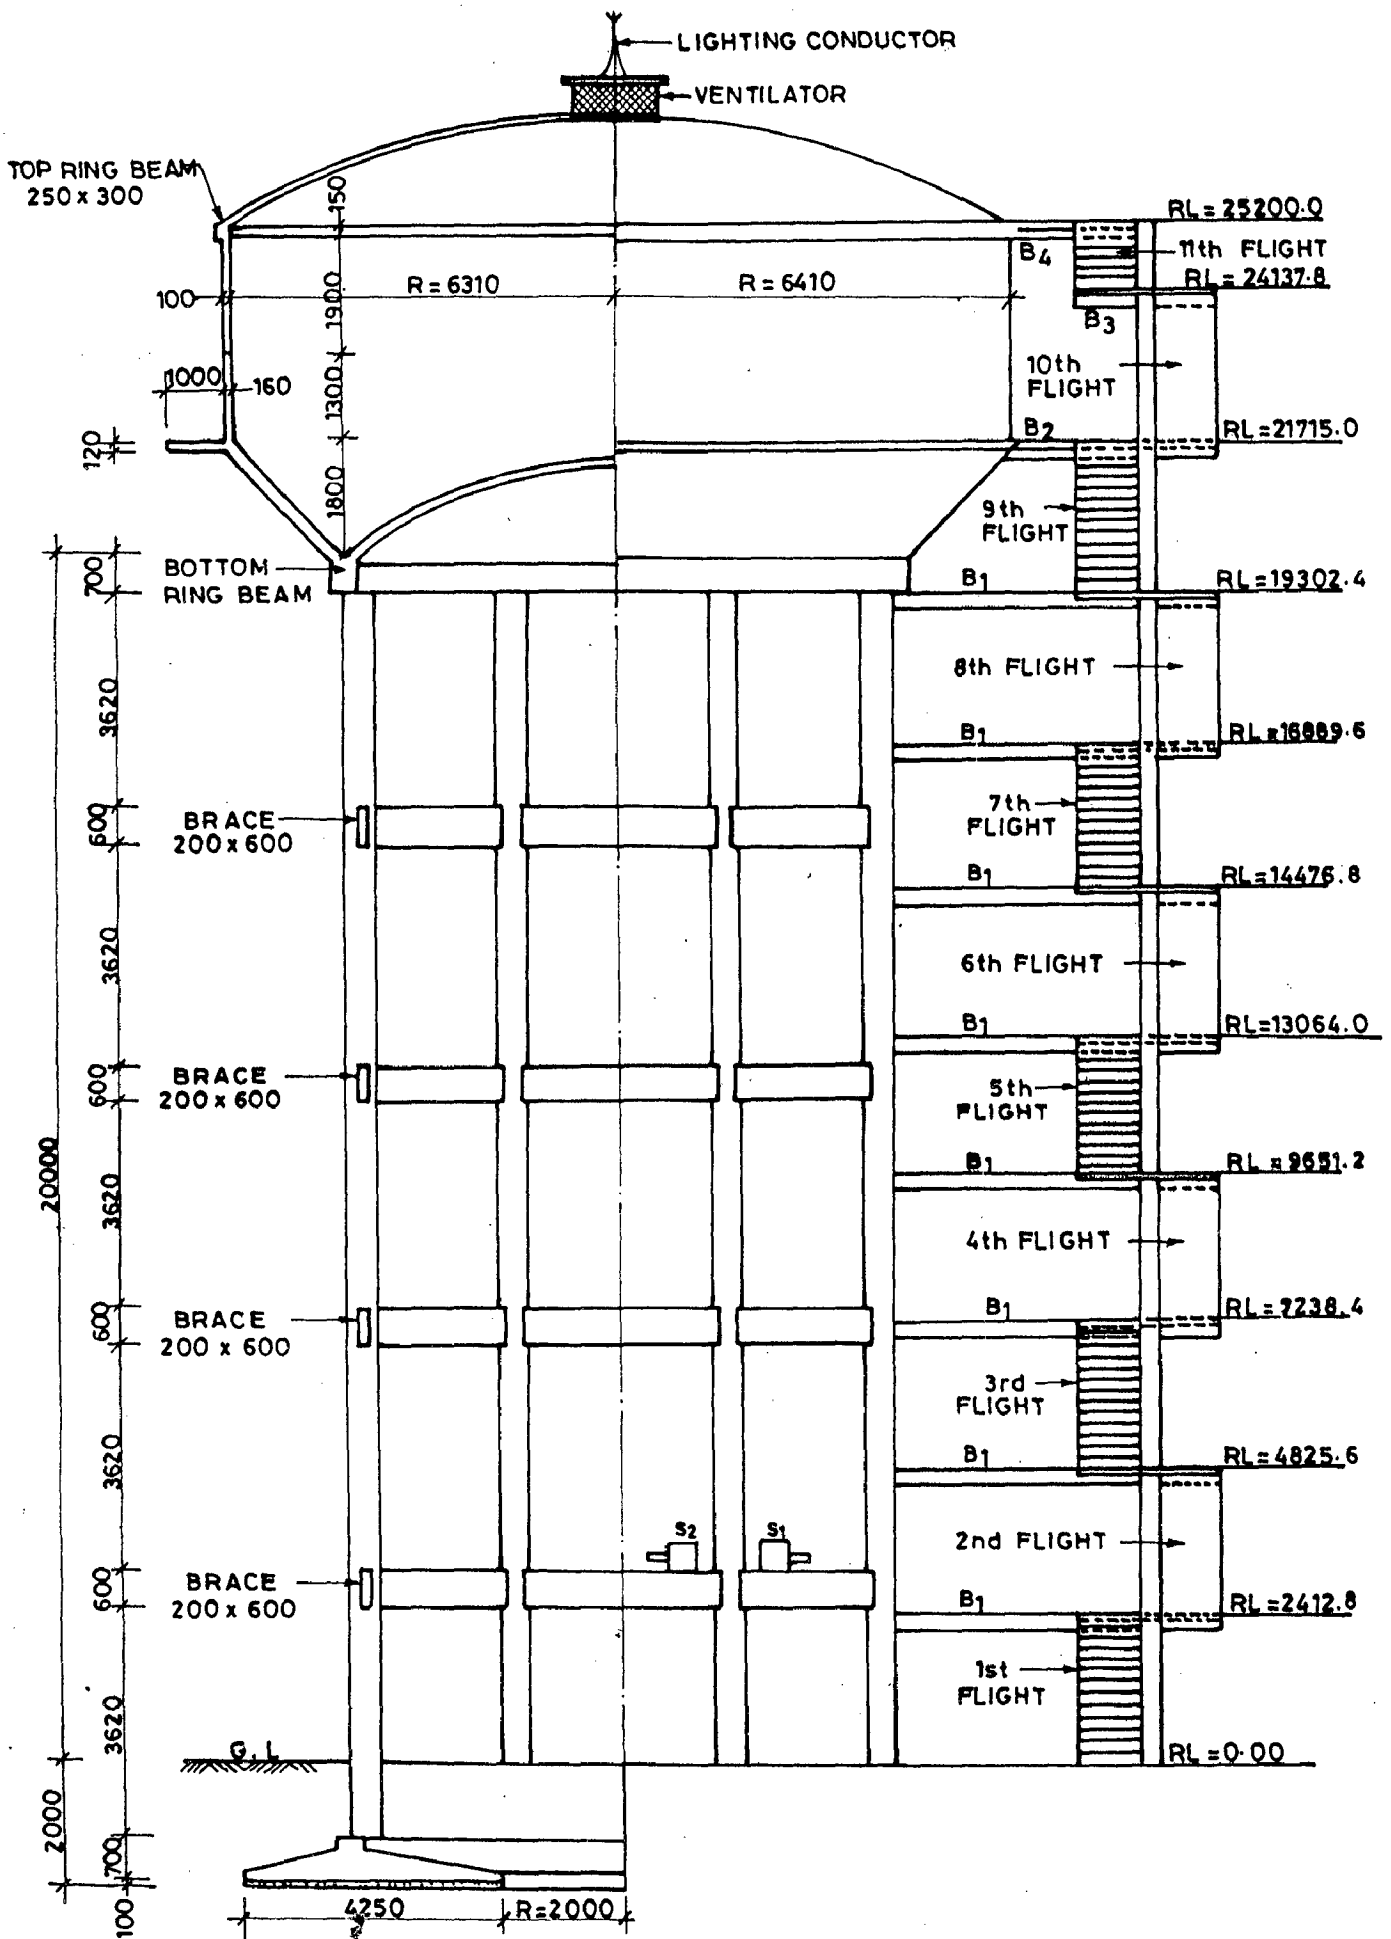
HALF SECTION - HALF ELEVATION OF WATER TOWER NEAR G.P. HOSTEL
